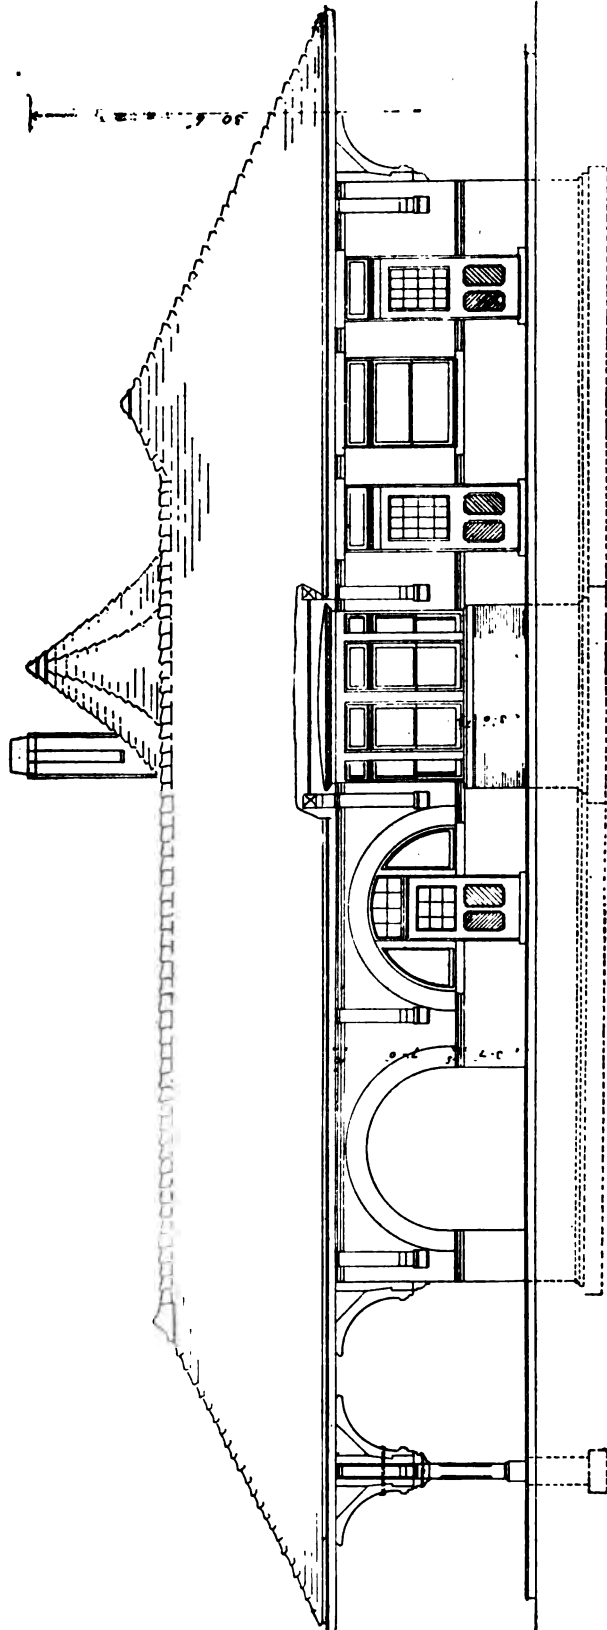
TRACK SIDE ELEVATION OF LOCAL PASSENGER DEPOT AT GLEN COVE, L. I., LONG ISLAND E. R. (PLAN NO. 88—CONTINUED.)
